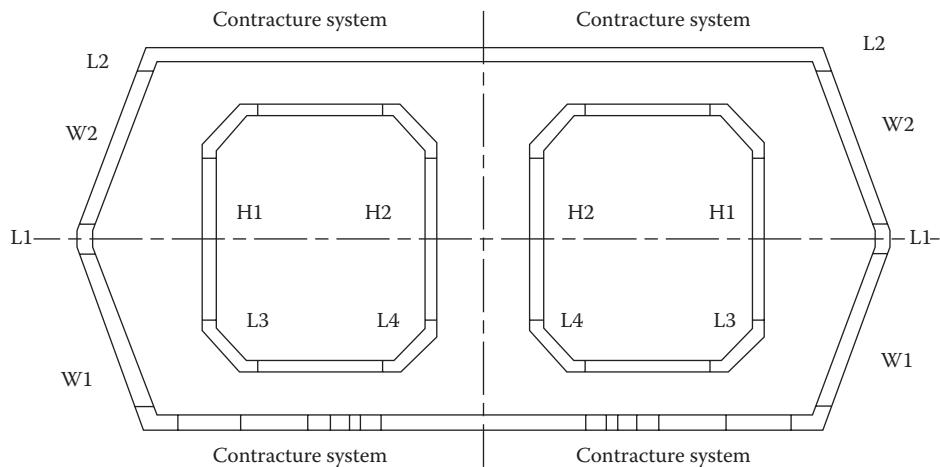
Plane layout of formwork, Jiangyin Bridge.
